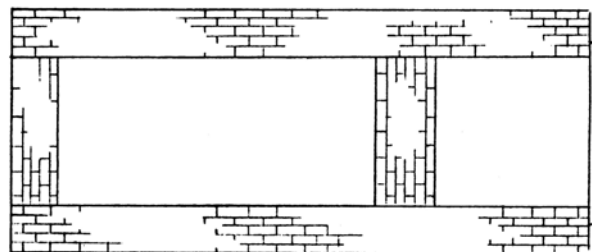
The footprint of a setting remnant of a return-tube boiler. Few of these boilers remain intact; most have been reduced to setting remnants and foundations. Twitty, *Riches to Rust*, 245.
